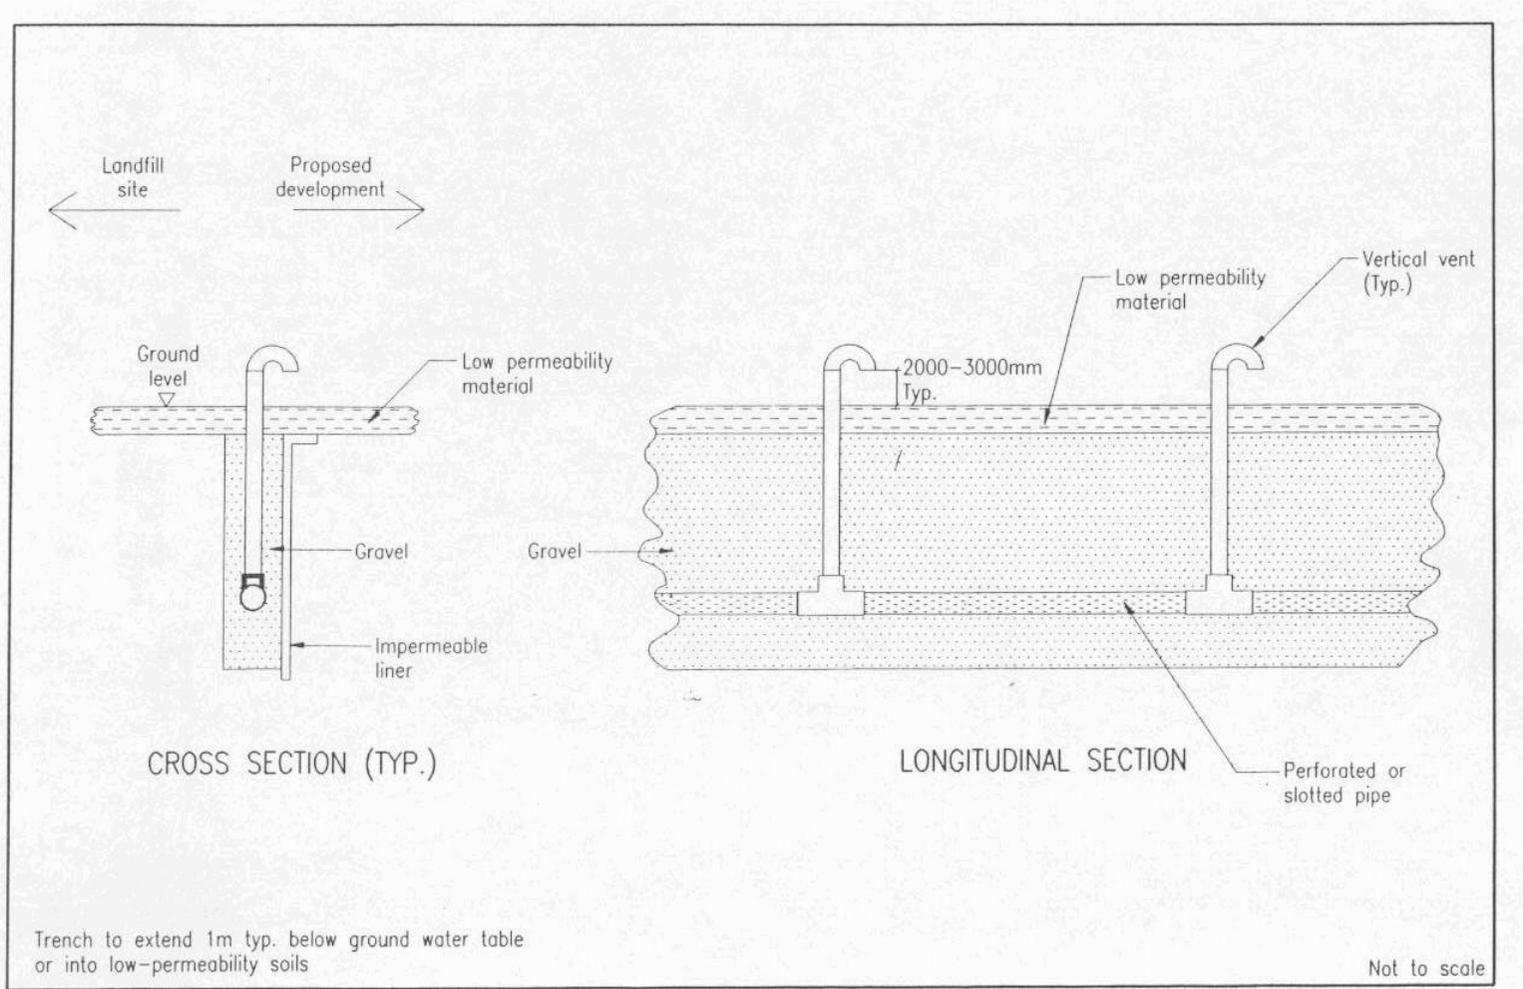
PASSIVE TRENCH VENT (OUTLINE)
